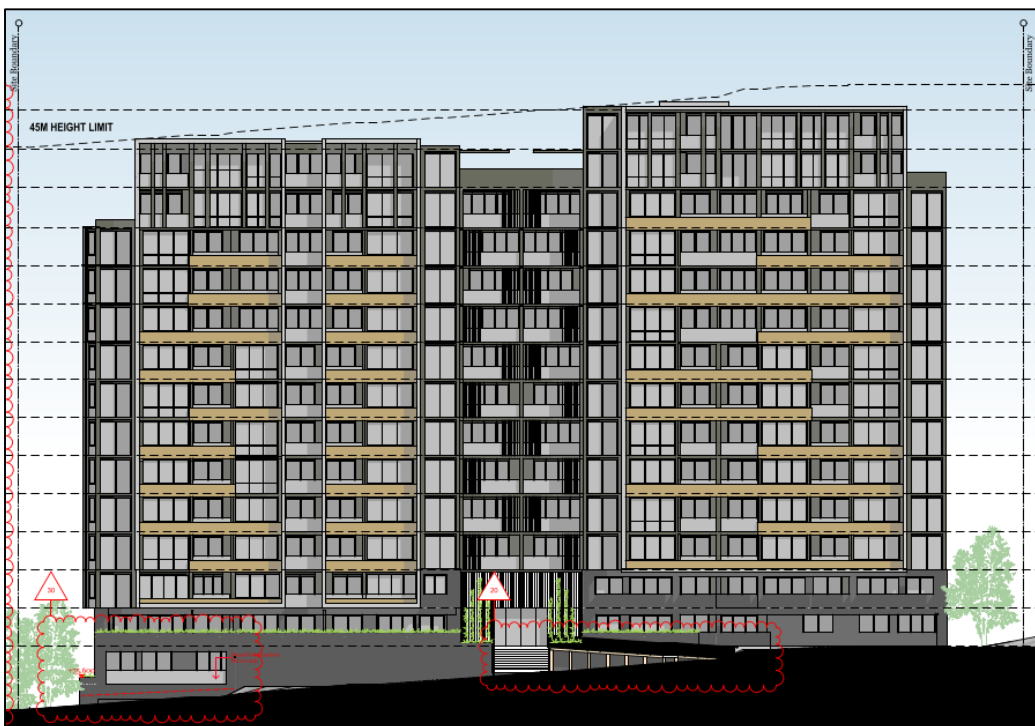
Amended north-eastern elevation (North Tower) from Eucalyptus Street
